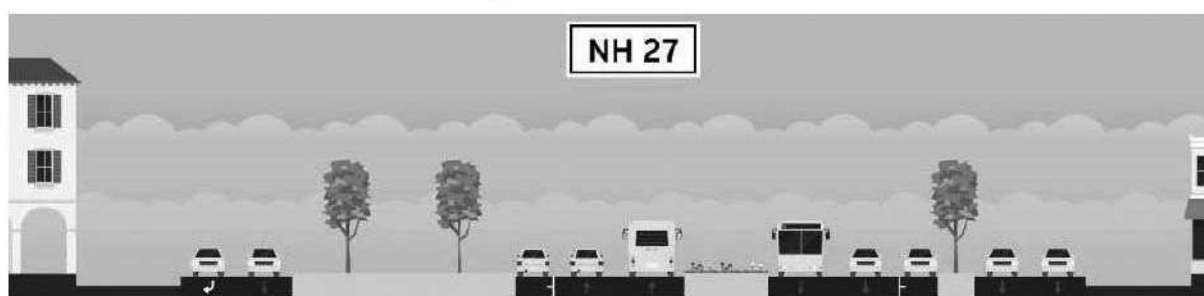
Existing 50m NH 27 Arterial road cross section
